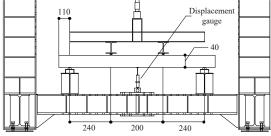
Distance between fulcrums of a vertical hydraulic jack
